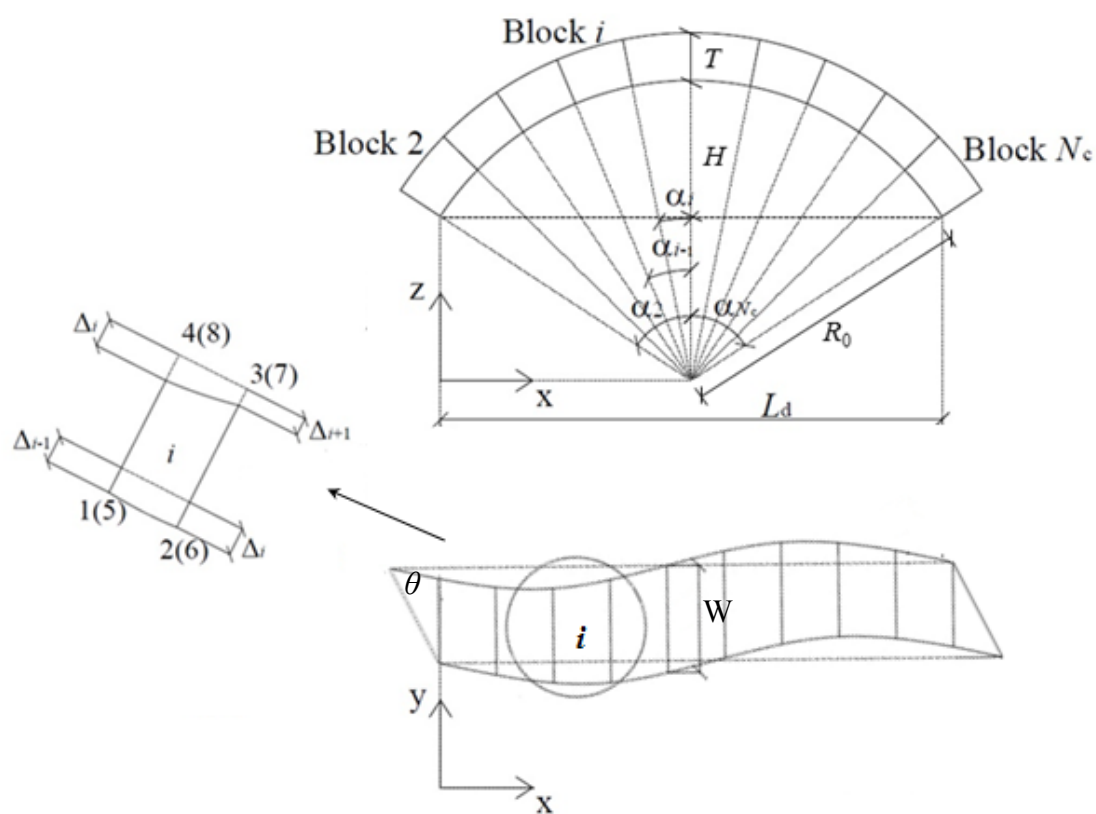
Elevation view and projection in plan of the extrados of a skew arch showing the position of a generic solid element
